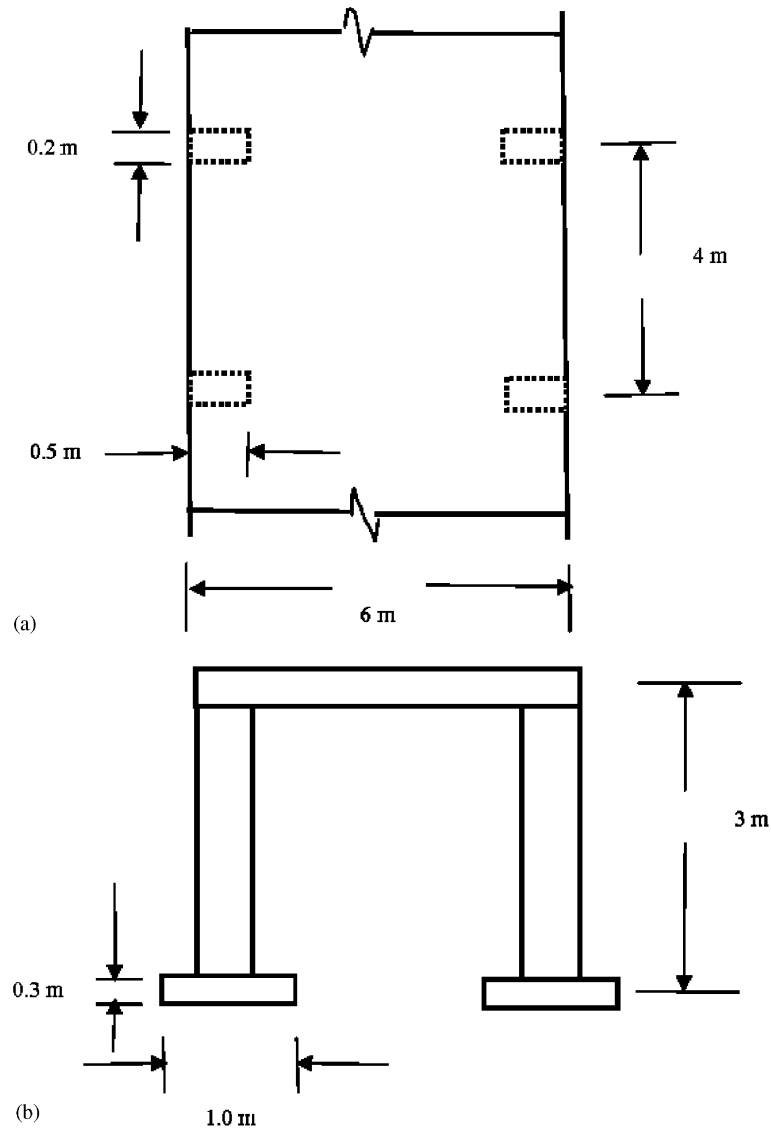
(a and b) Typical open-plane frame on isolated footings.
